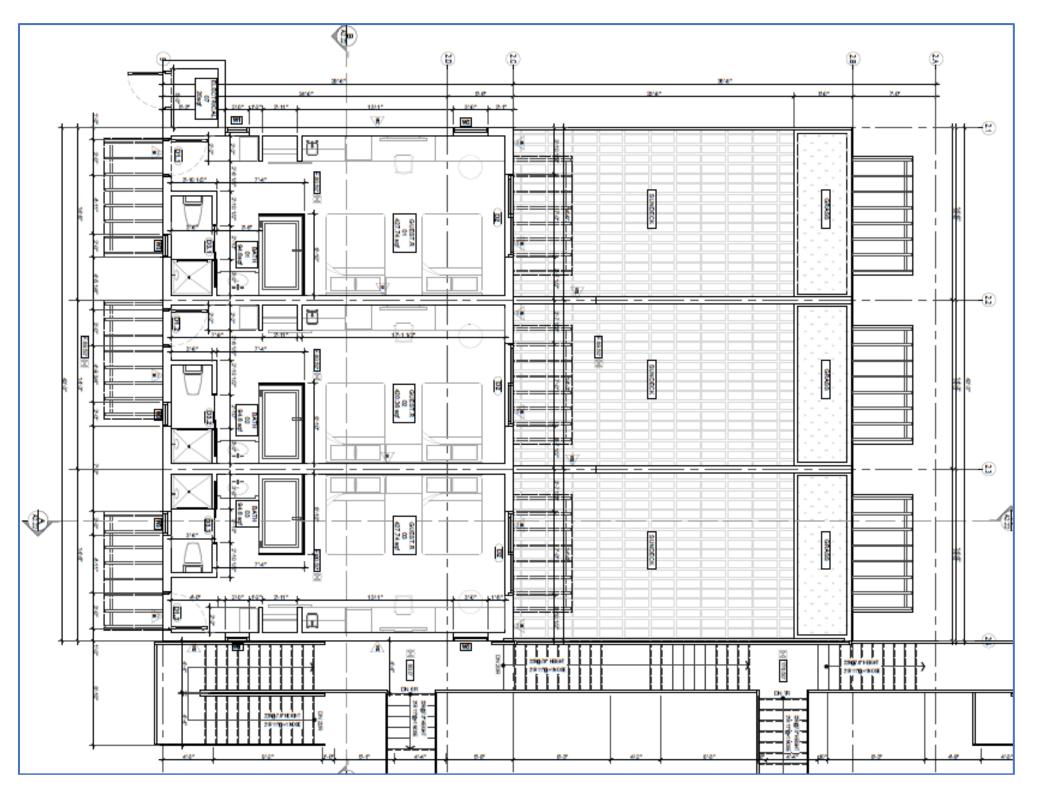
Lower floor of the North and South wings in the *Proposed Development* (refer to Buildings 3 and 4 in Figure 3 for a 3D rendering of the structures). The lower floor of the North and the South wings will have the same floor configuration. This floor will house smaller guestrooms than the ones in the Centre wing but will have large sundeck areas closer to the shoreline. *Image modified from HNPA Architecture+Planning Inc. by Coastal Raintree Consulting, Ltd.
